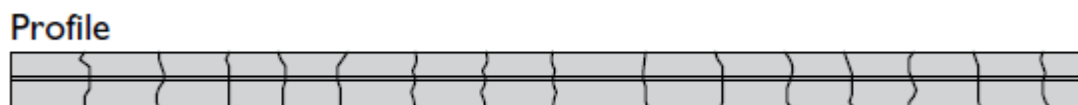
Continuously Reinforced Concrete Pavements (CRCP) (Delatte 2008)
